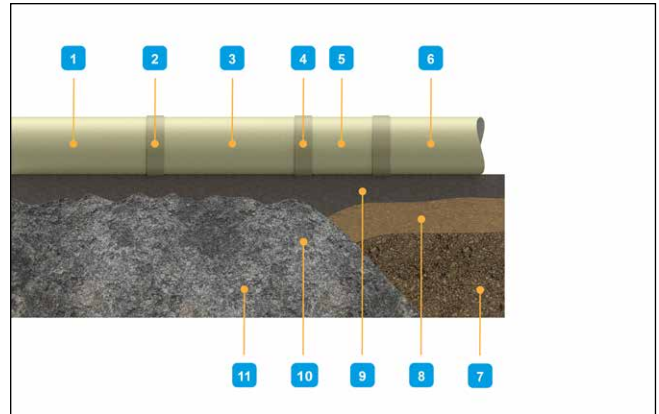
Method of trench construction and pipe layout at a rock-soil transition¹
